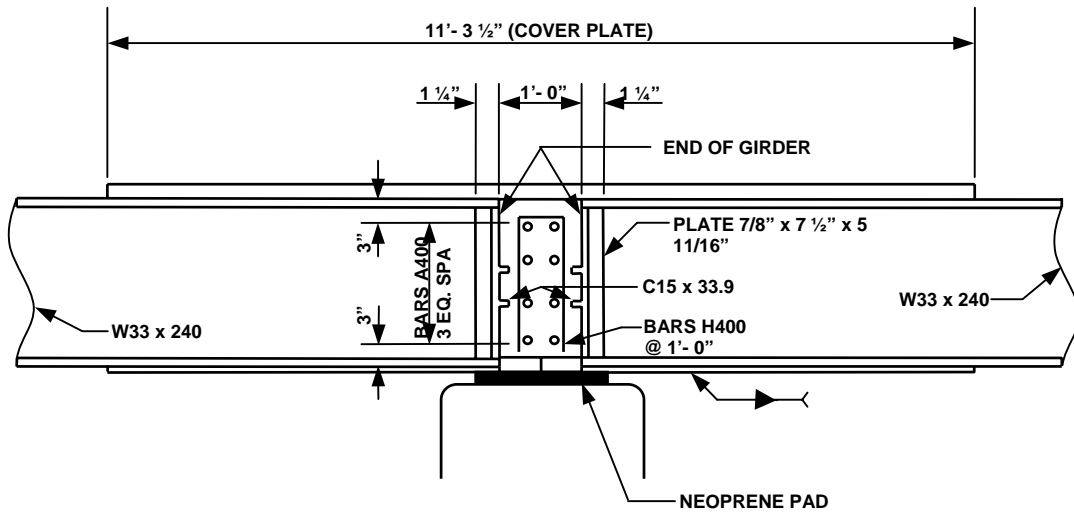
Pier Elevation for Dupont Access Road (TDOT 2002)
